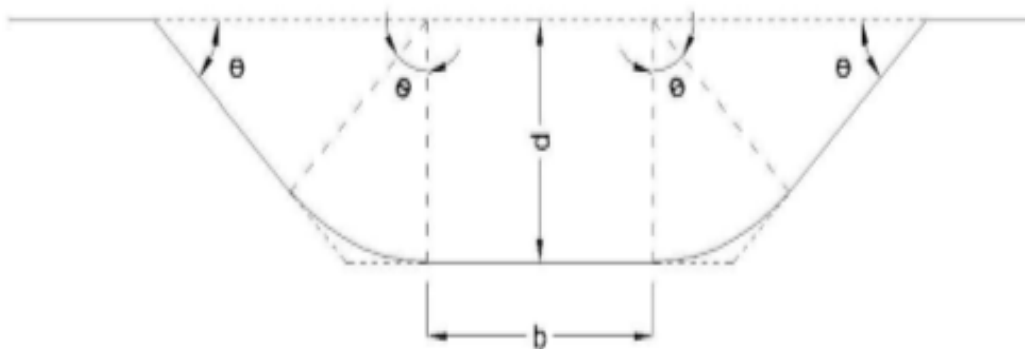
Trapezoidal Canal With Rounded Bottom Corner Section
